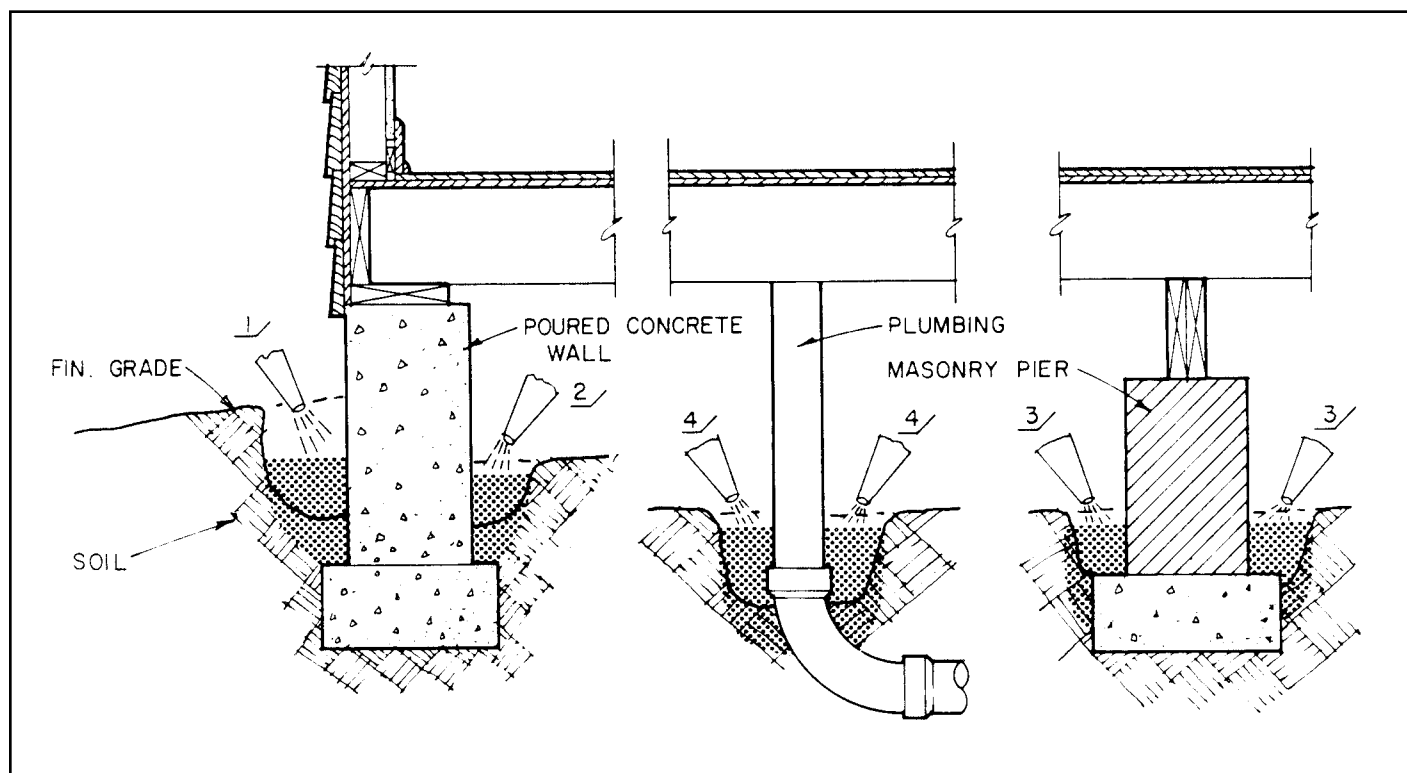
Application of chemical to crawl space construction. Soil treatment (1) along outside and (2) inside foundation wall; (3) around pier and (4) plumbing (adapted from USDA).
